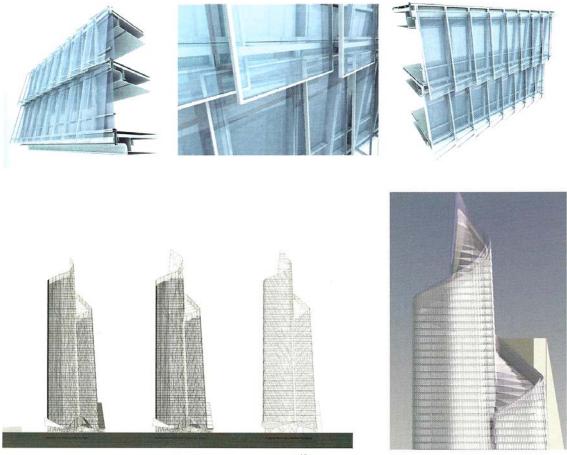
The Pinnacle Building Facade Drawings <sup>45</sup>
